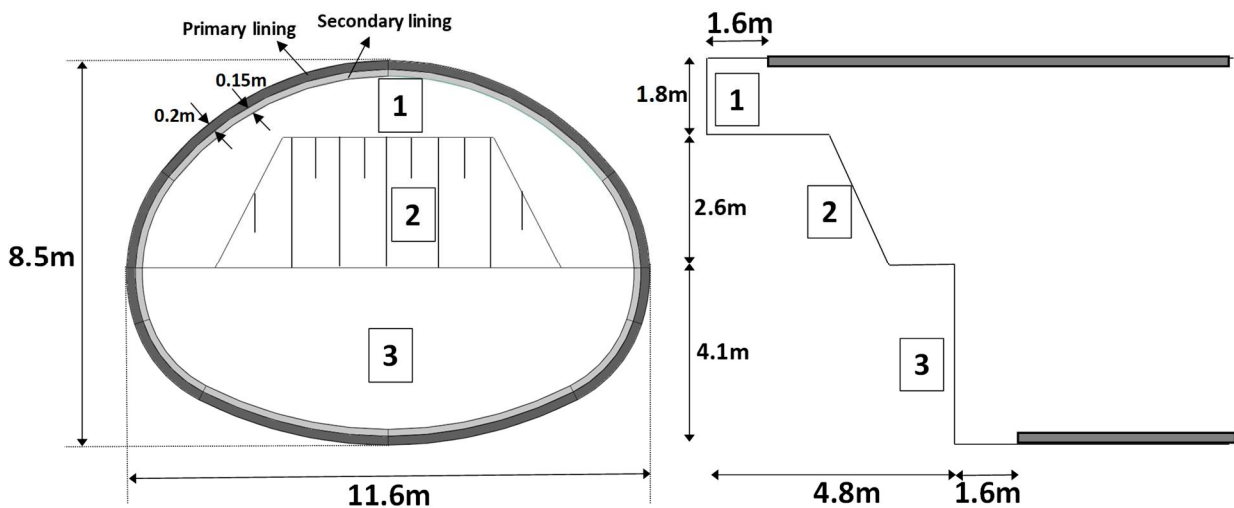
Transversal and longitudinal cross section of the Paraiso tunnel.
